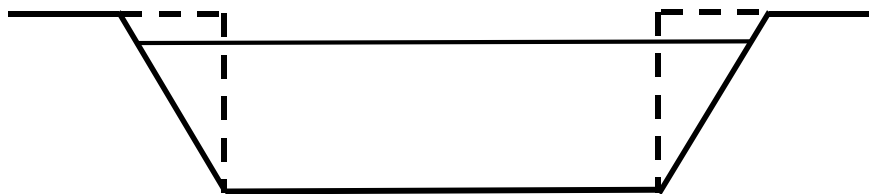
Spurs at corners of trapezoidal cross-section of entrance
